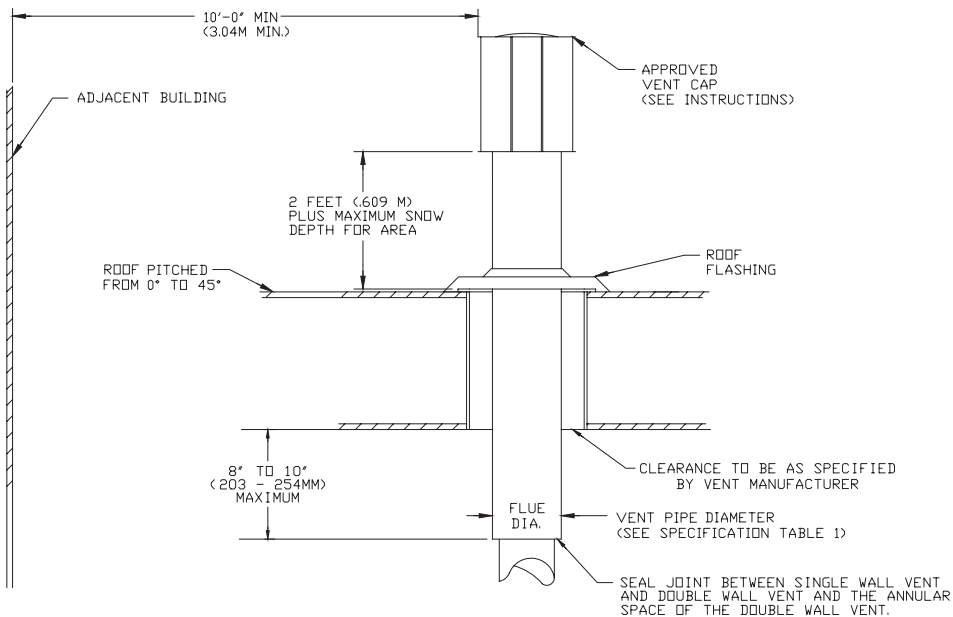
B – Vertical Arrangement – Single Wall Vent System to Double Wall Termination
